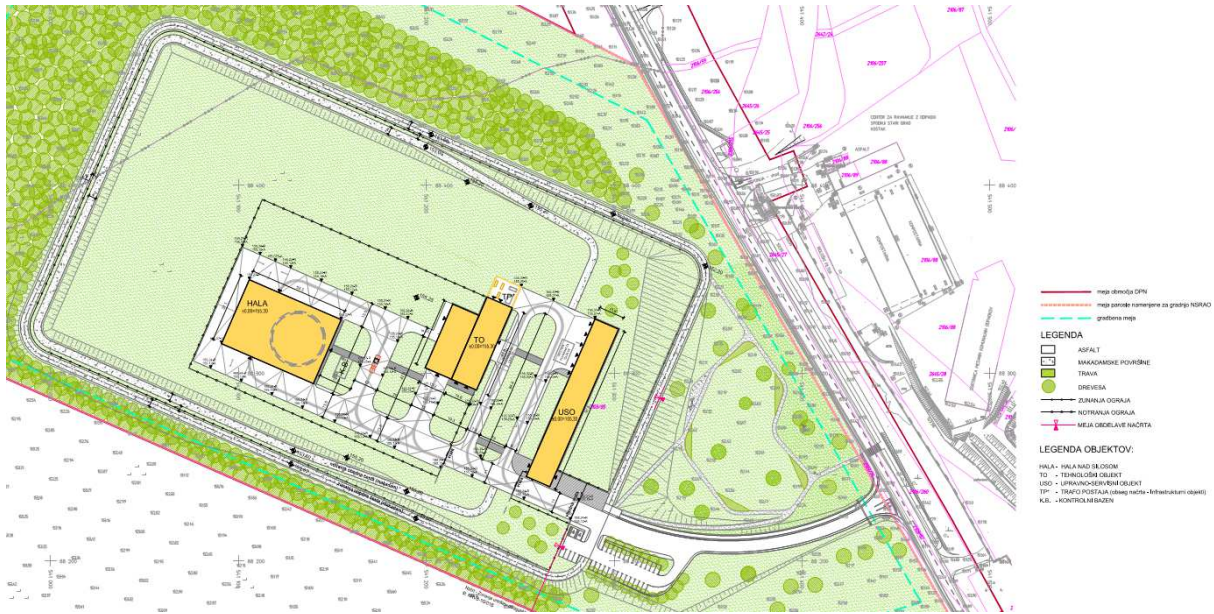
Layout of repository structures with repository borders (fences) marked. [6]
